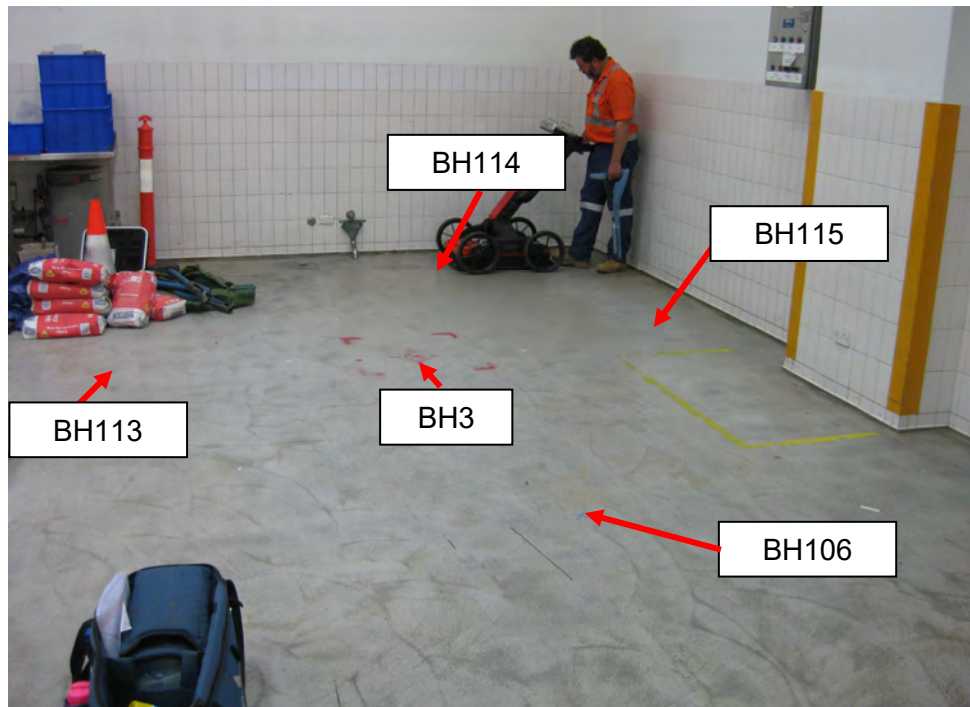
View east within the Gate Gourmet Rail Catering Facility (Lower Ground Floor level). The locations of boreholes BH106, BH113, BH114 and BH115, and BH3 are indicated as shown.
